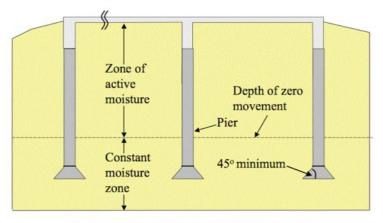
Drilled and Underreamed Concrete Piers
